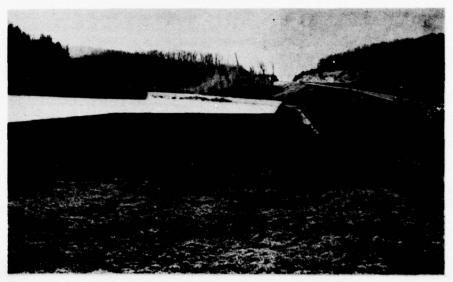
View of north side of wall taken from right abutment. White spots on face of wall are seepage areas. Drainage ditch, abandoned tracks, and Route 23 can also be seen (Photo taken May 1, 1978)
